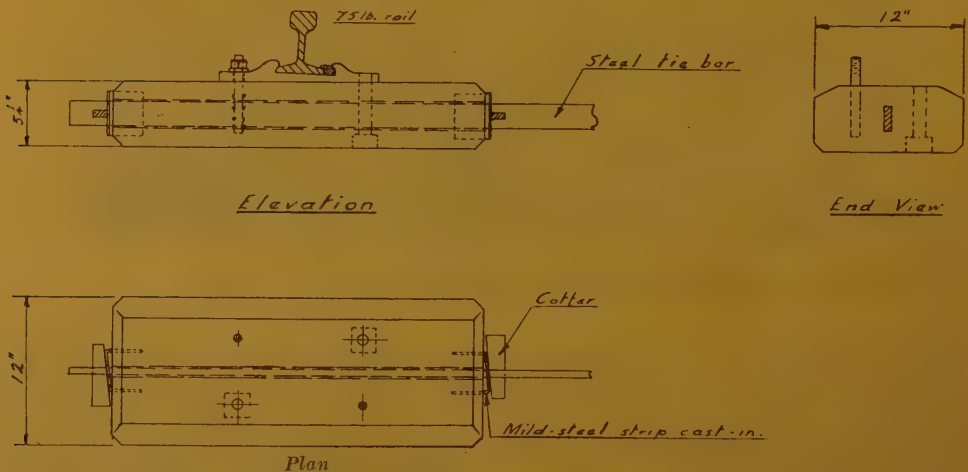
Reinforced concrete sleeper block for use in sidings. Indian Government Railways.
